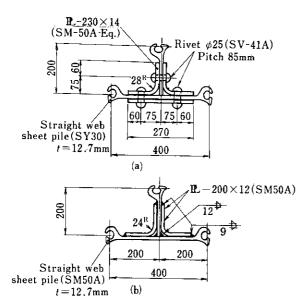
Cross sections of standard "T" connection sheet piles designated in the standard shown in Reference No. 3
